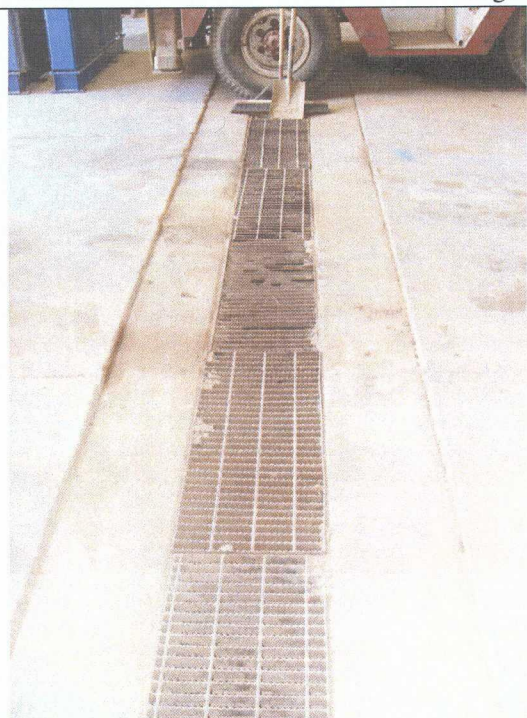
Drain pan area in first building supposedly drains in to a BGT. Not known. Needs to be kept cleaned and inspected.
